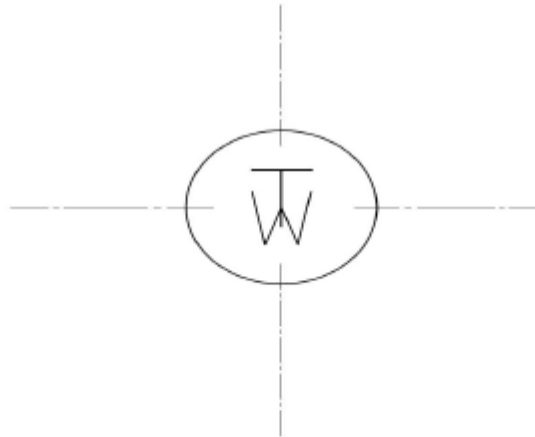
IDENTIFICATION OF A TRU WELD STEEL HEADED STUD ANCHOR
